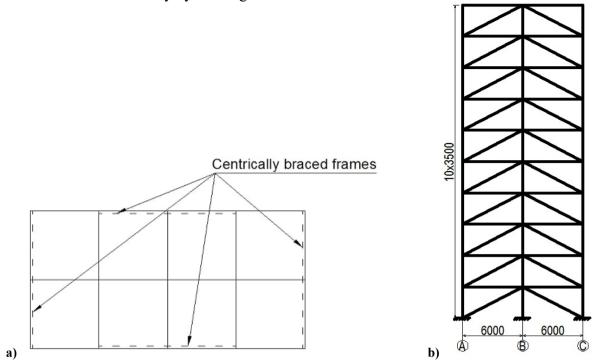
a) Plan view of the structure with the location of the braced frames; b) Elevation of a braced frame.
